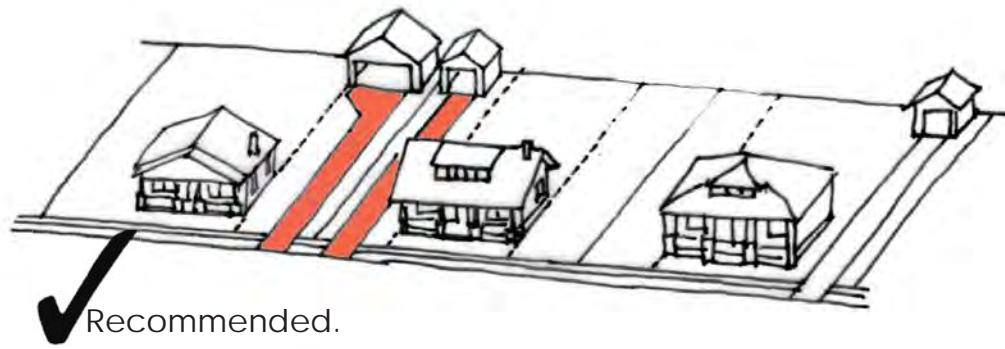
Continue use of residential driveways that provide access to garages placed to the rear of lots. Avoid placing garages in the side yard or attached to buildings with doors facing the streetscape. *Source: JMA collection.
